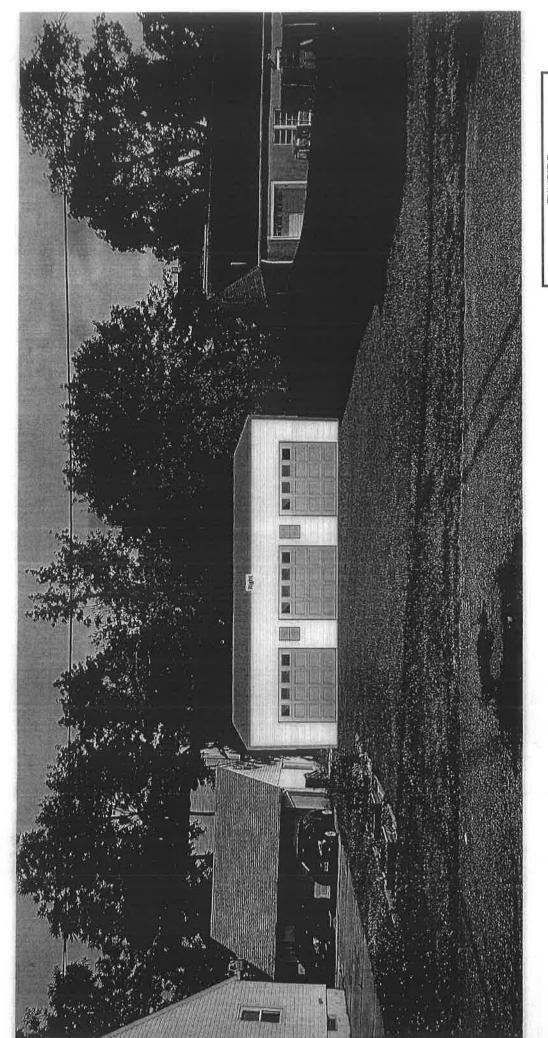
EXHIBIT B PROPOSED GARAGE RENDERING NOT TO SCALE
